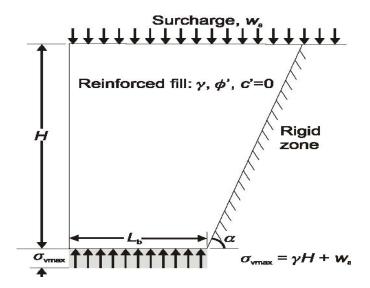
Maximum vertical stress at the base of the constrained reinforced soil wall
